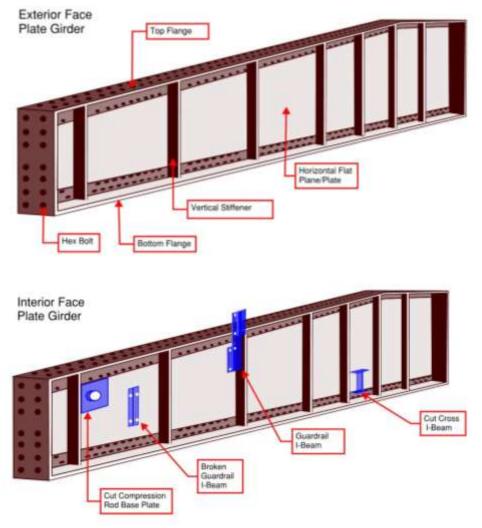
Schematic of the construction of the plate girders. All elements are named on this drawing. (Drawing: EverGreene (March 22, 2023)
